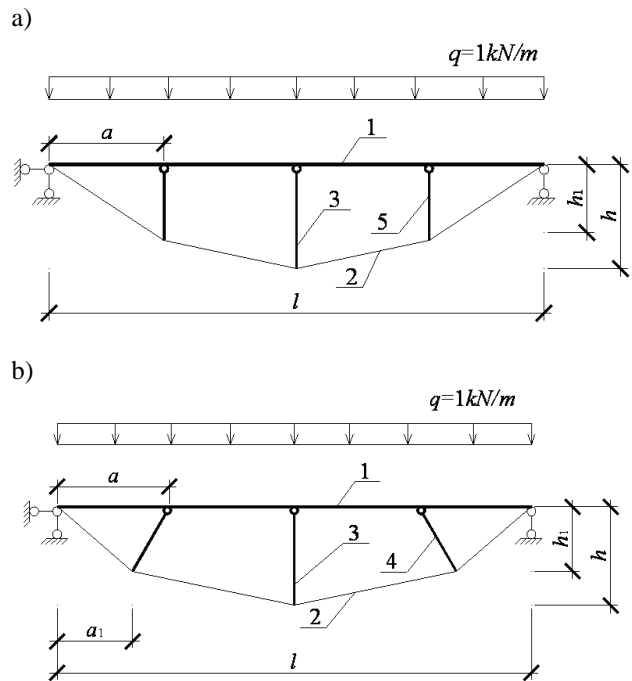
Design schemes of the trussed steel beams: a) – variant with the vertical edge pillar; b) – variant with the inclined edge struts; 1 – top chord; 2 – bottom chord; 3 – central pillar; 4 – edge strut; 5 – edge pillar; a – distance from the support to the joint of the edge strut with the top chord; a_1 – distance from the support to the joint of the edge strut with the bottom chord; h – height of the trussed beam; h_1 – vertical dimension of the edge strut or edge pillar.
